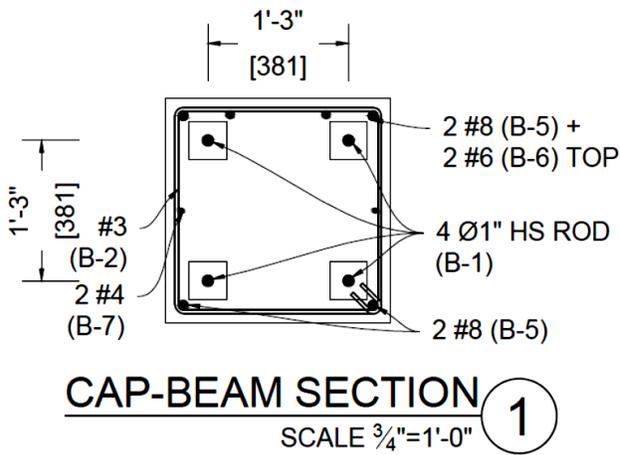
Cap Beam Pocket Connections (Mehrsorouh and Saiidi, 2014)
